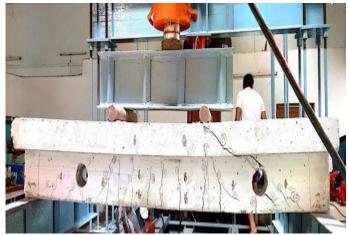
Failure Pattern of Unstrengthened Beam at ultimate load
